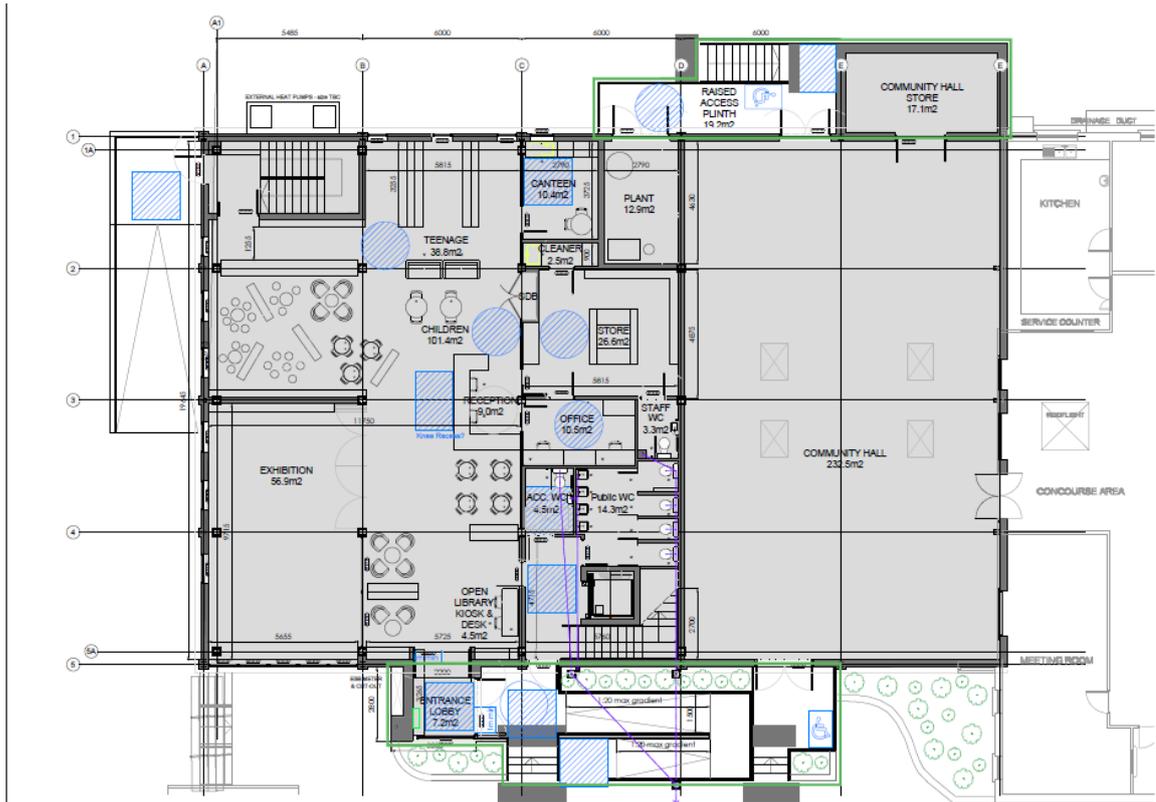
Proposed development plan Ground Floor (Kenneth Hennessey Architects)
